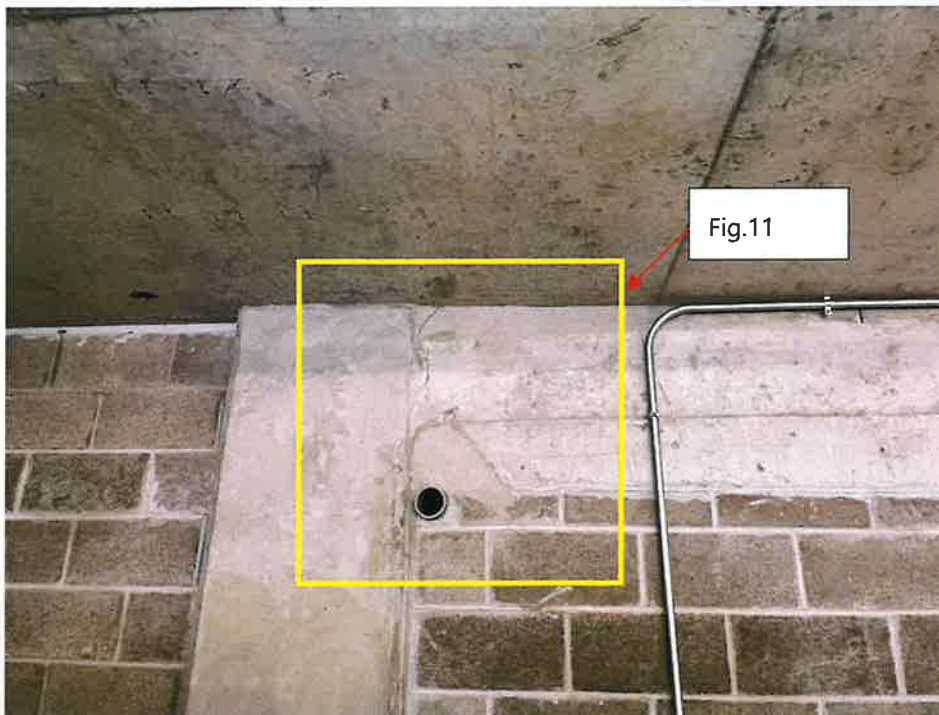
Cracking/Delamination at Beam to Column Connection
